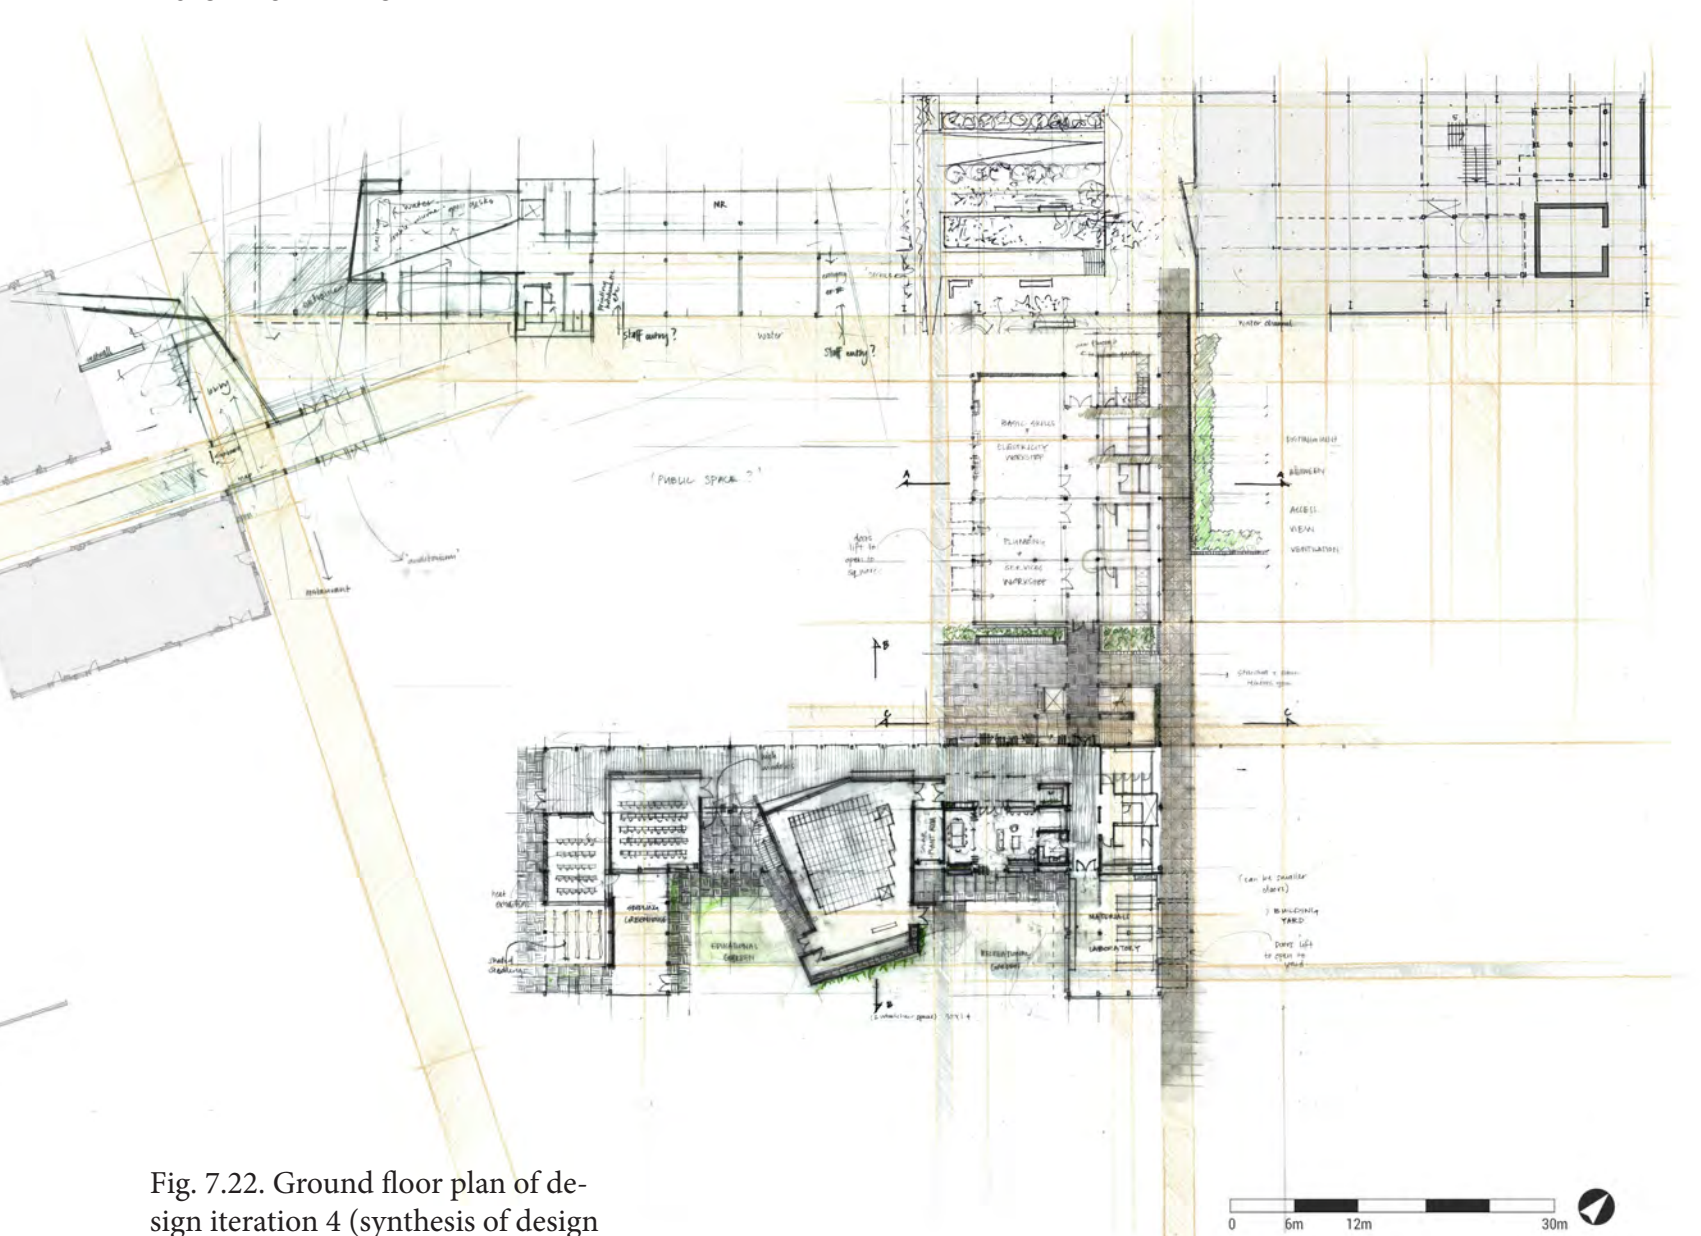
Ground floor plan of design iteration 4 (synthesis of design)
